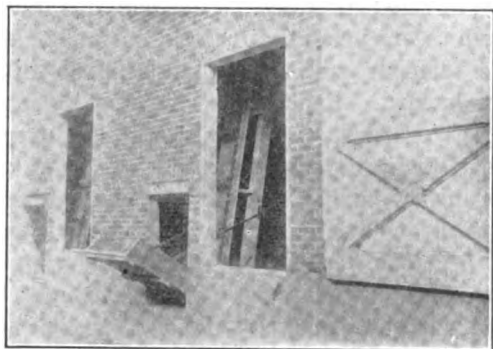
EQUIPMENT TO HANDLE MATERIAL FROM CARS
